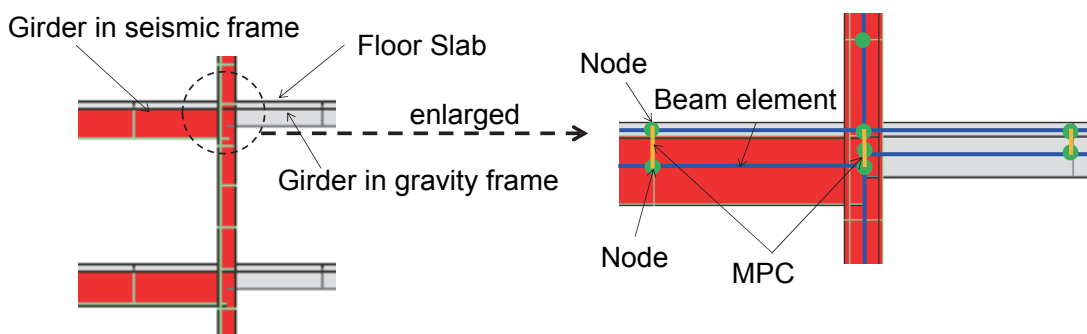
Multiple-point constraint (MPC) condition between nodes of the slab and girder
